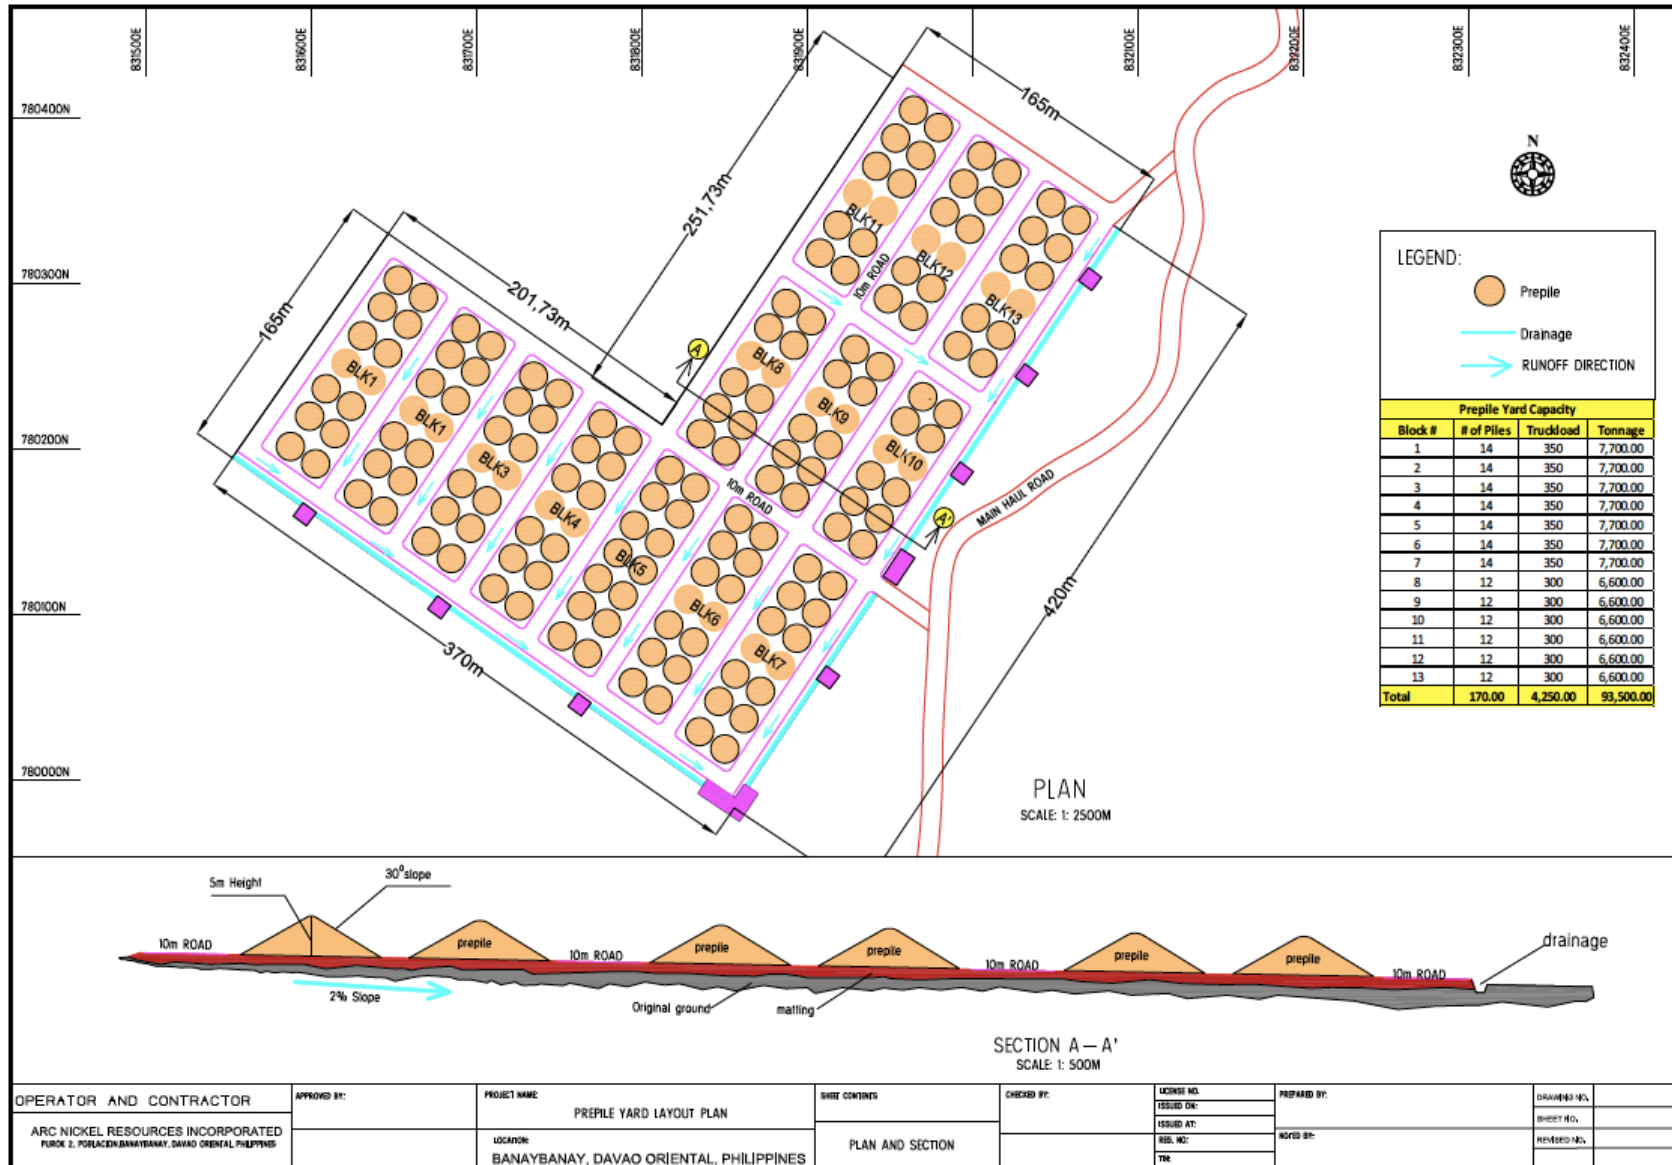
Pre-pile Yard Layout Plan (Source: RCMC)
